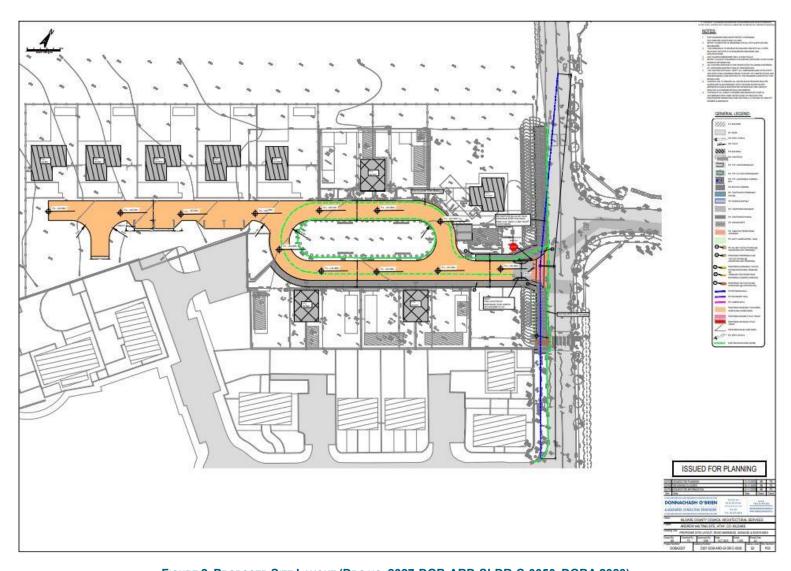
PROPOSED SITE LAYOUT (DRG NO. 2327-DOB-ARD-SI-DR-C-0050, DOBA 2023).
